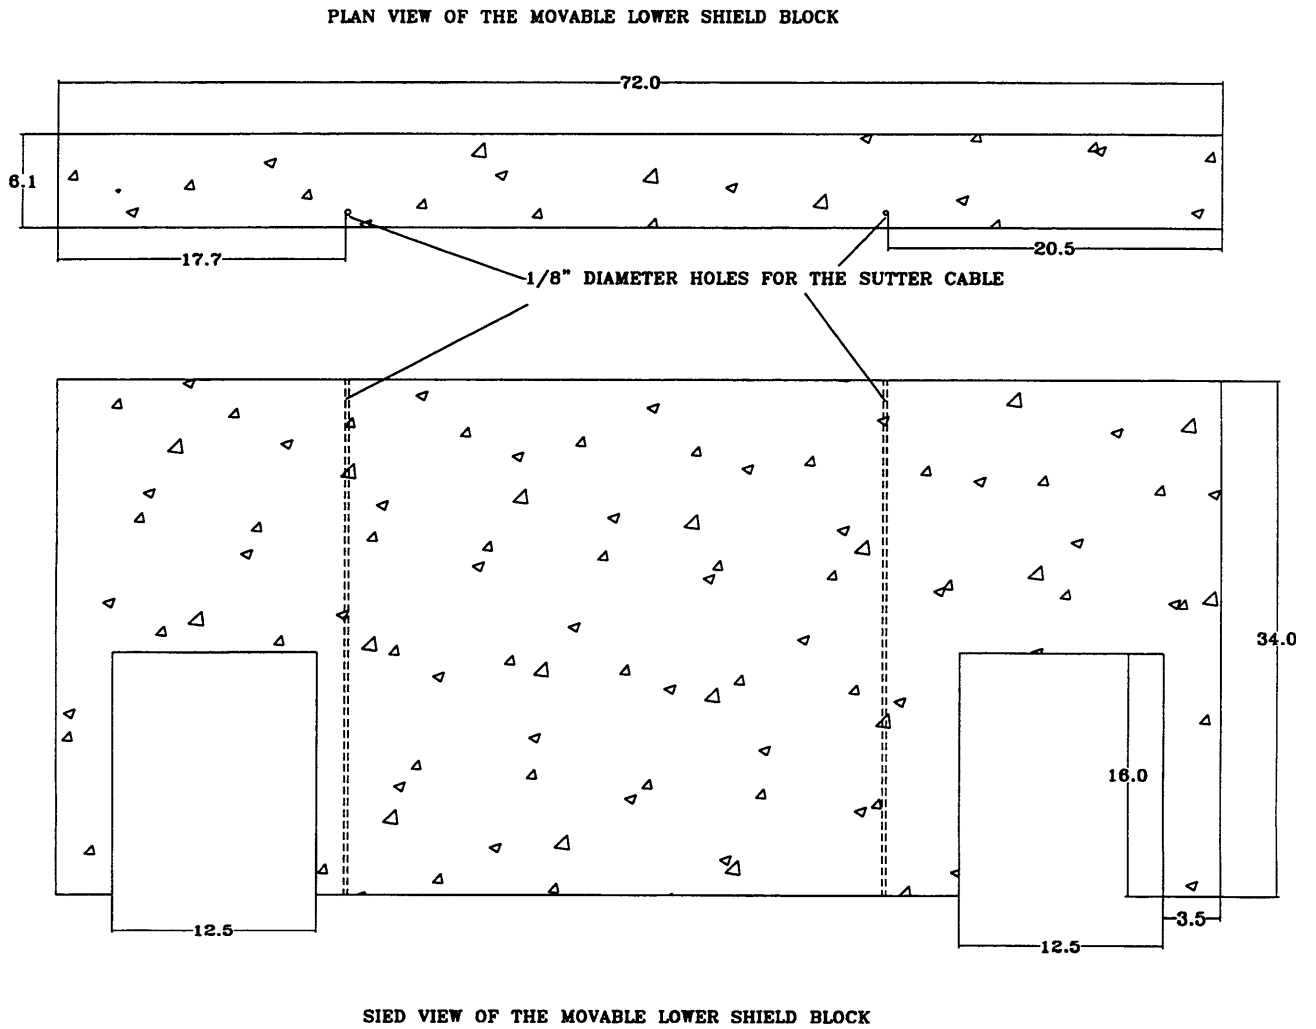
Removable lower shield block side and plan views are shown. All dimensions are in inches.
